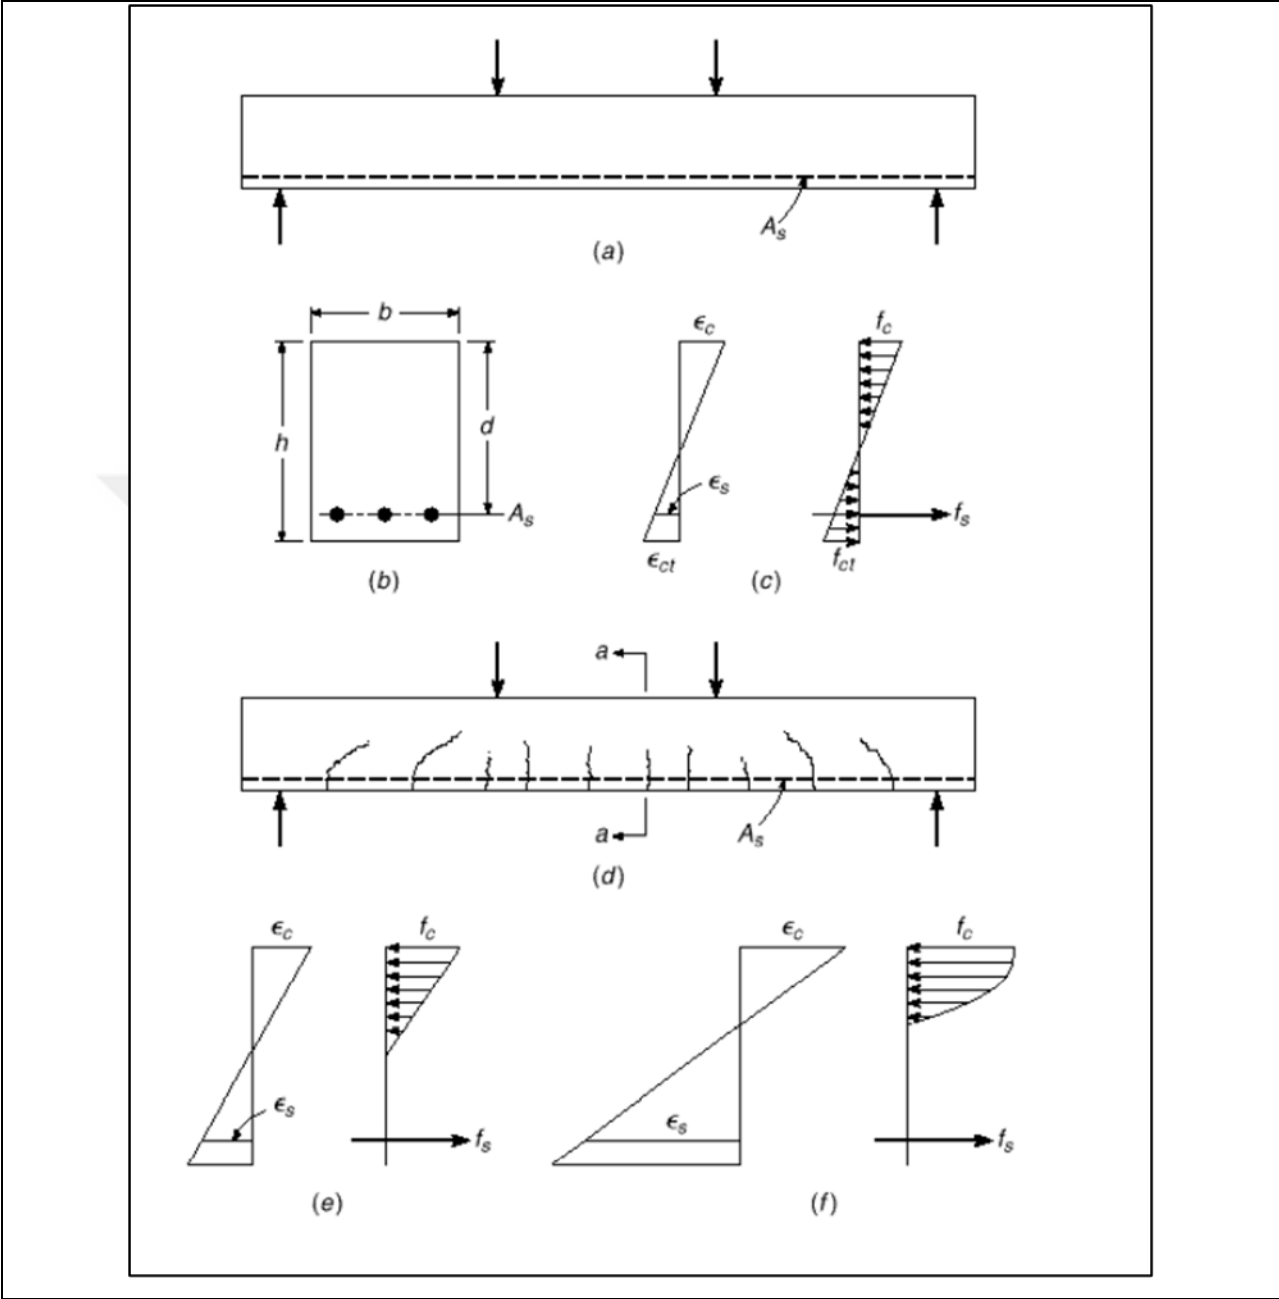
(a) RC longitudinal section (b) Cross section of the beam (without openings) (c): Tension and compression stresses (d) Longitudinal section of beam with cracked cross section (e): Stresses behavior in cracked section elastic relationship (f): Stresses behavior in cracked section (plastic relationship) [54].
